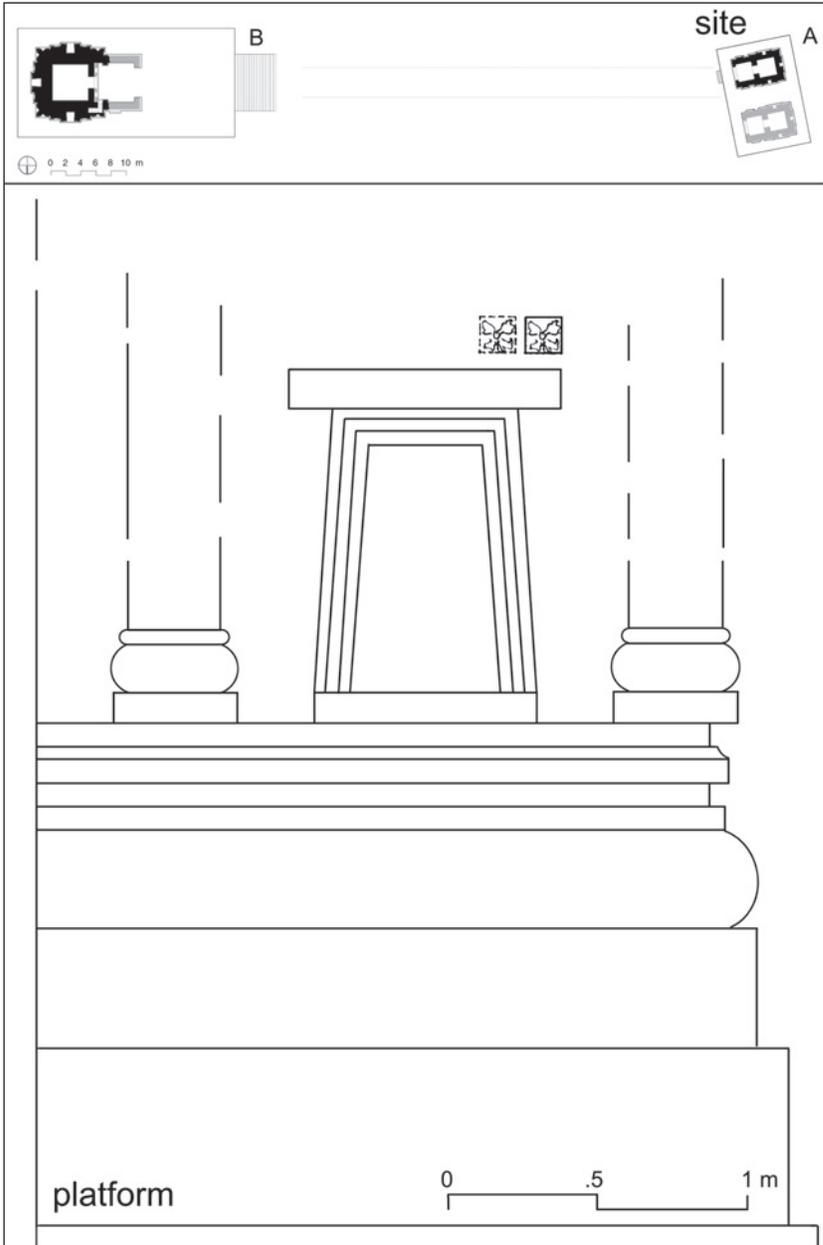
Amb, Temples A and B, site plan; remains of Temple B's platform.
